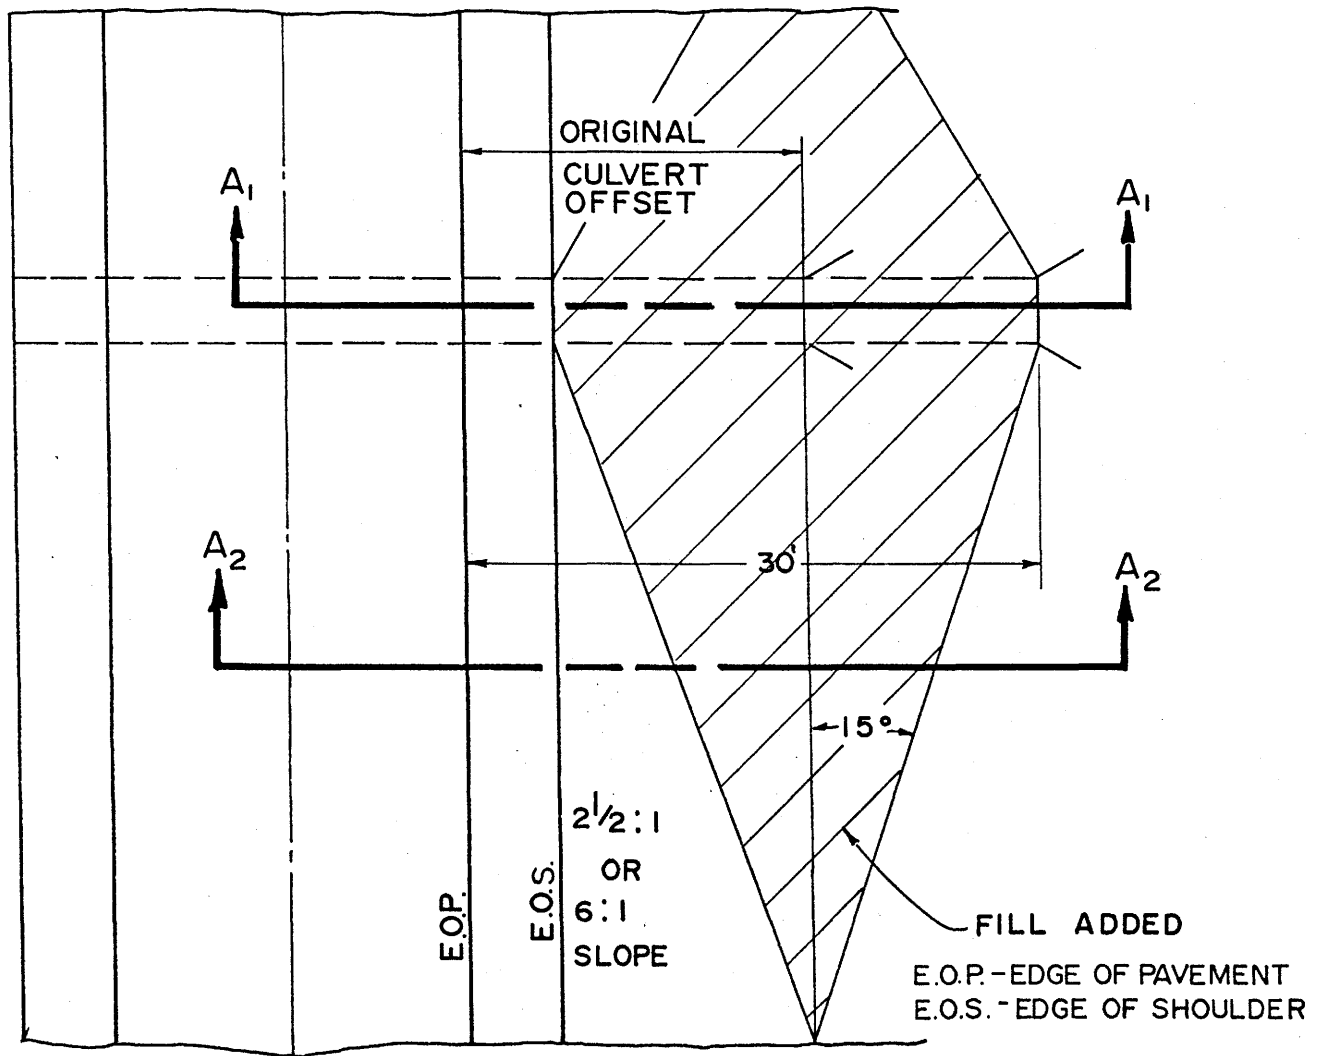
(CONTINUED). TYPICAL ROADWAY SECTION WITH THE VARIOUS CULVERT DESIGNS
